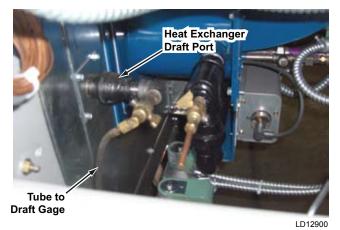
DRAFT OVER FIRE TEST PORT
